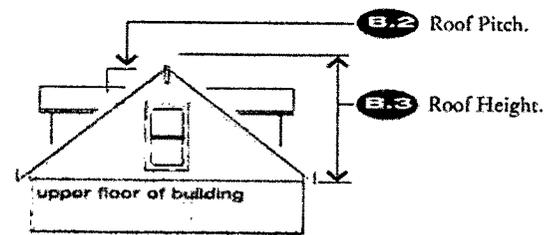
Figure VI-B. Pitched Roof Cap Type (Gable Roof).
